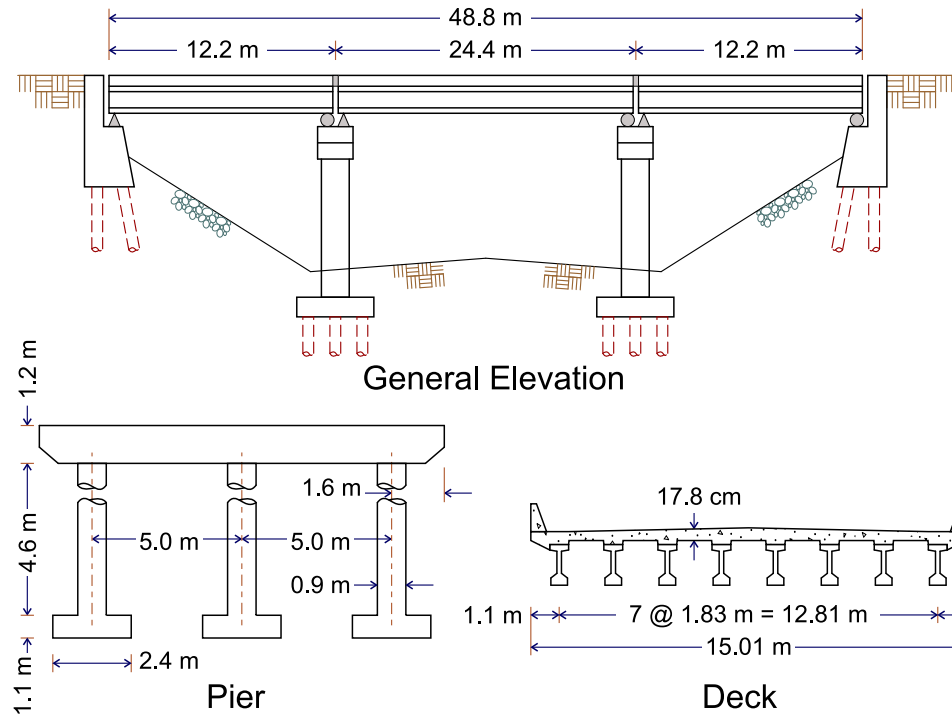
MSSS Concrete Girder Bridge Configuration.
